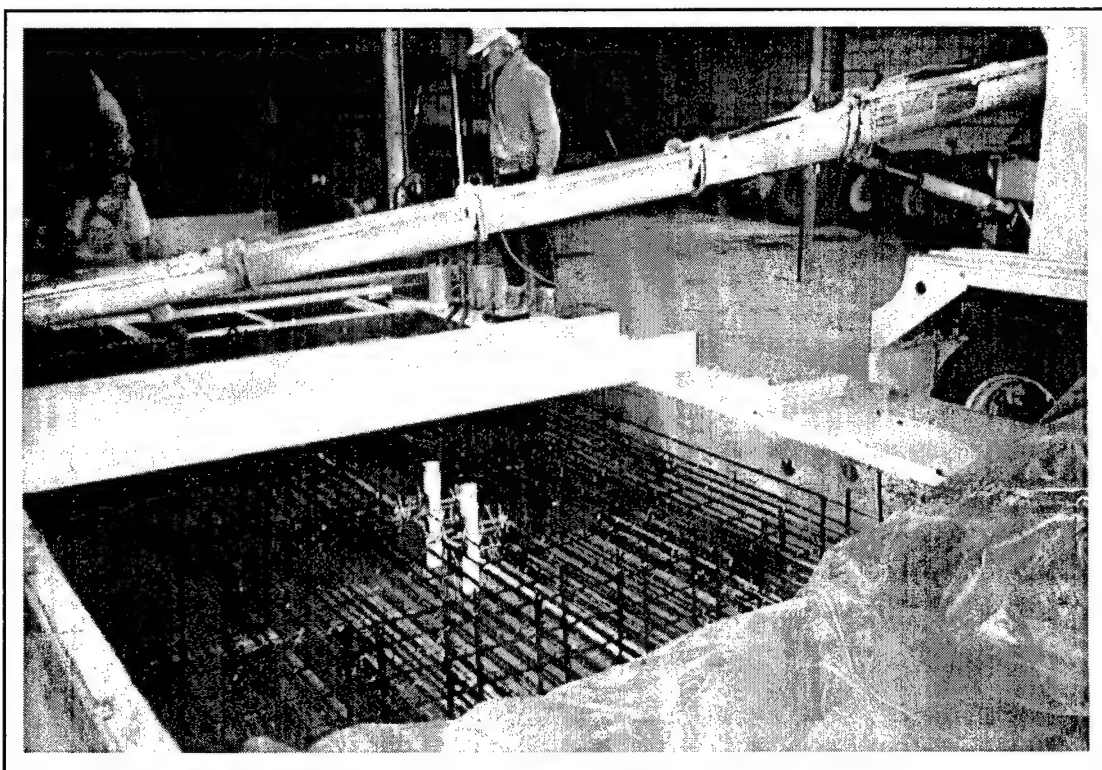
Vertical plastic ducts in Deck 2 to facilitate load tests.
